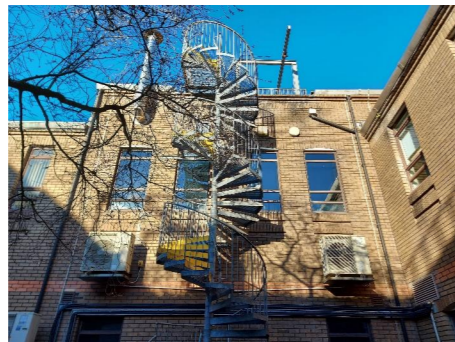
Overview of the current means of escape arrangement from plant room 4D.
